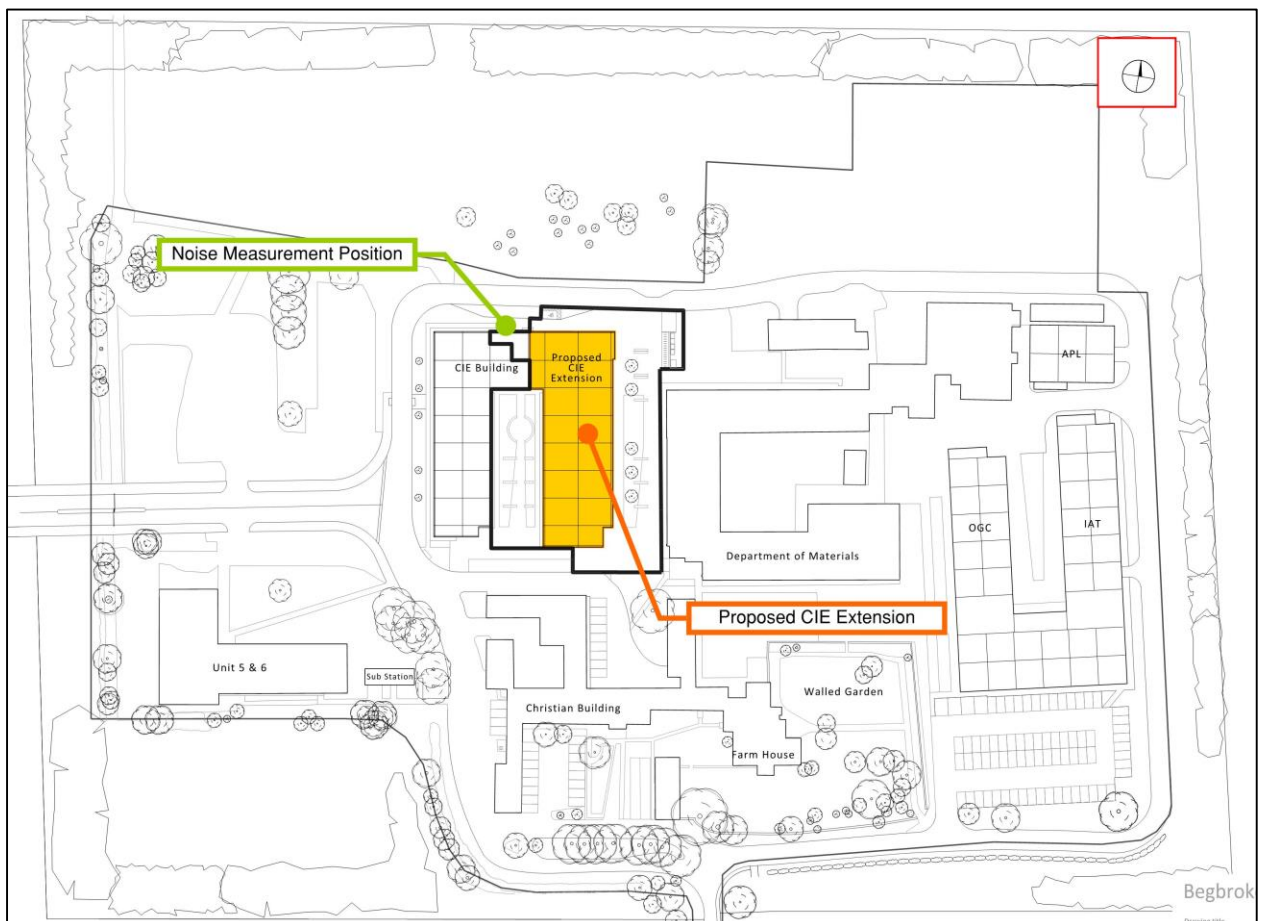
Proposed Site Plan (SRA Architects Drawing 3141-050-E) showing noise measurement position with development highlighted.
